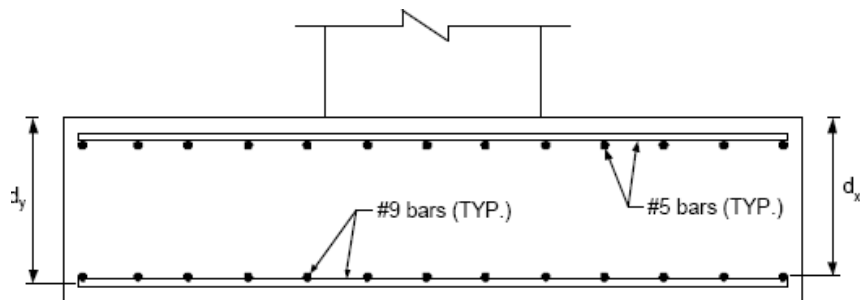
Cross Section of Footings (Modjeski and Masters, Inc.)
